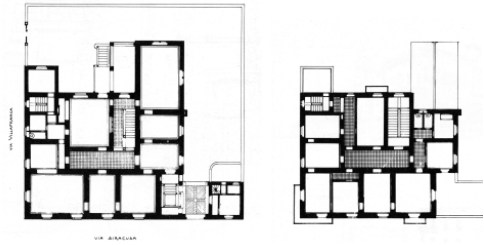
E. Basile, Casa Basile, Palermo, 1903, plan of the mezzanine and first floor plan of the latest version (Archivio Eredi Basile, Palermo).
